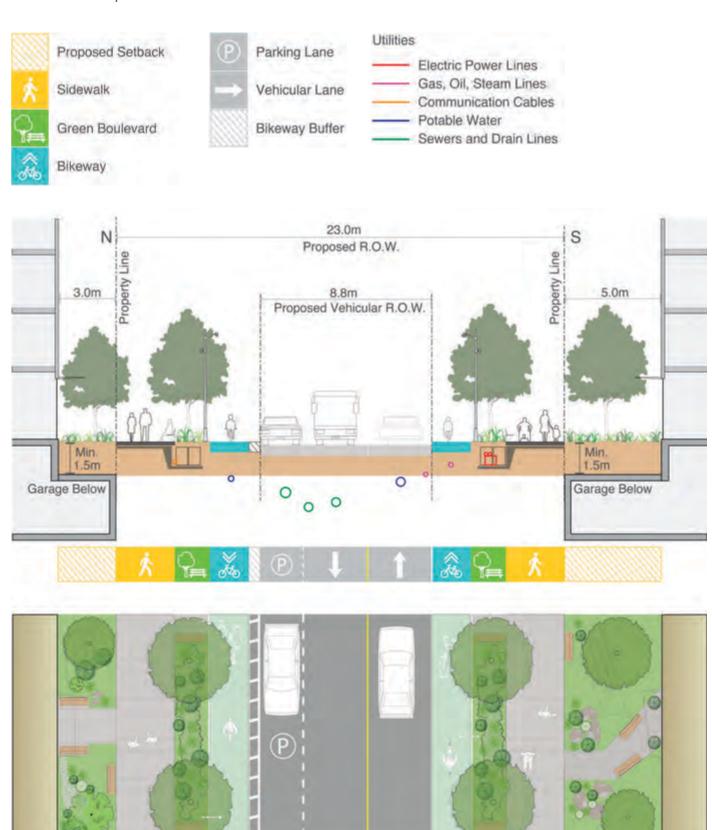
Section and Plan of Davisville Community Street - Recommended Final Condition
